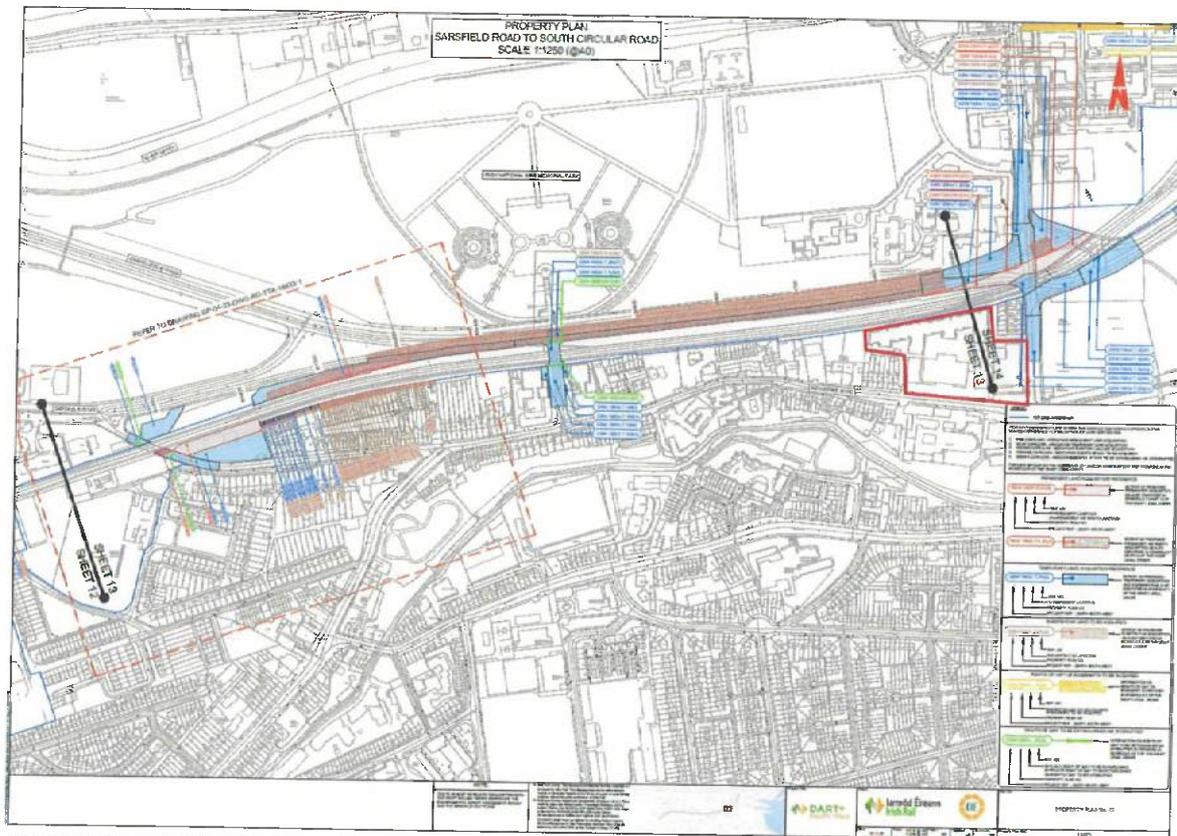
Property Plan for the section of the railway adjacent to the subject property (Property Plan No. 13)
